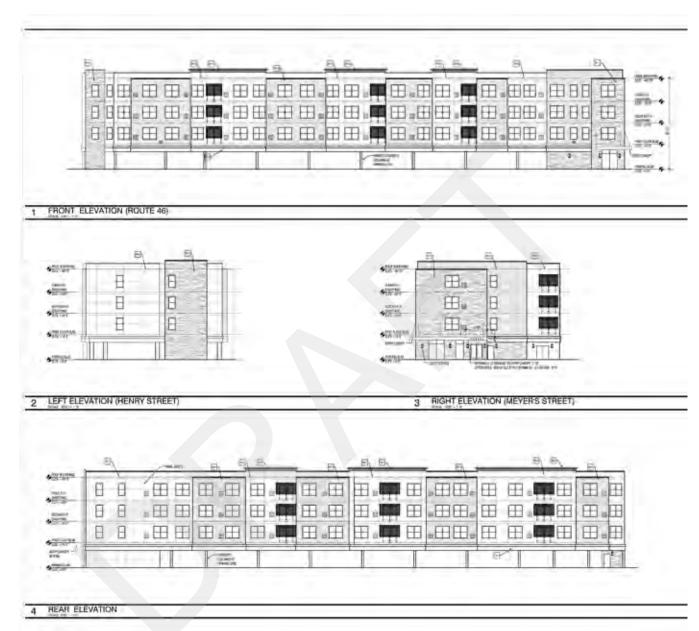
Conceptual Building Elevations (Mistry Design)
